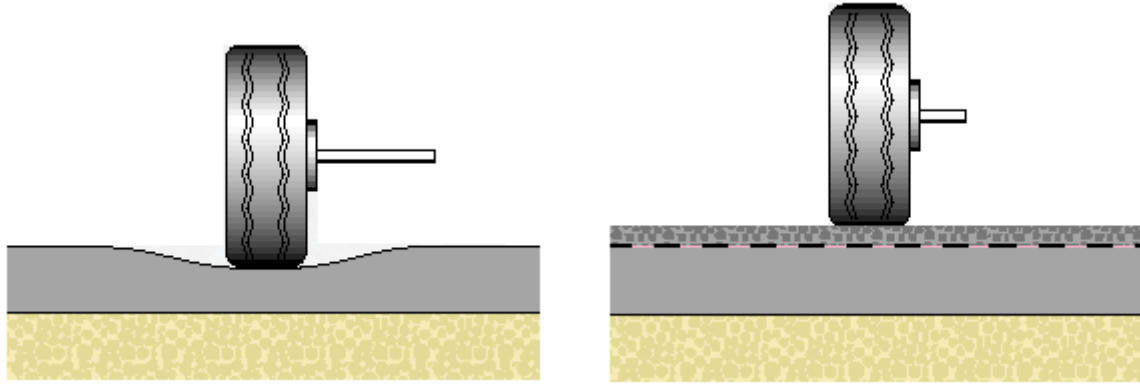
Use of ARTER® GTS A Geogrids for repaving deteriorated old asphalt layers
